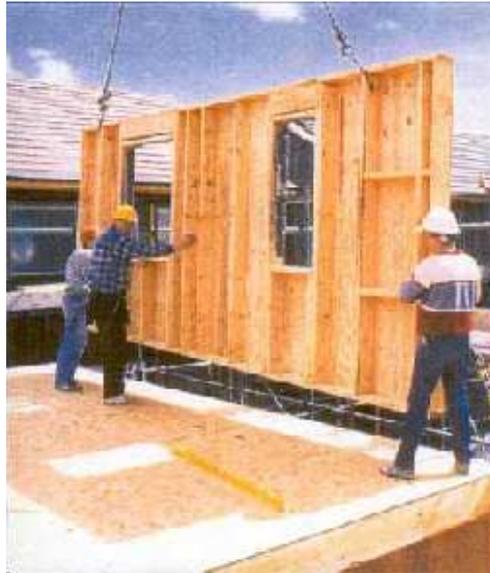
Example of a timber frame construction (Source: Joseph Rowntree Foundation and SPRU, 2001)
